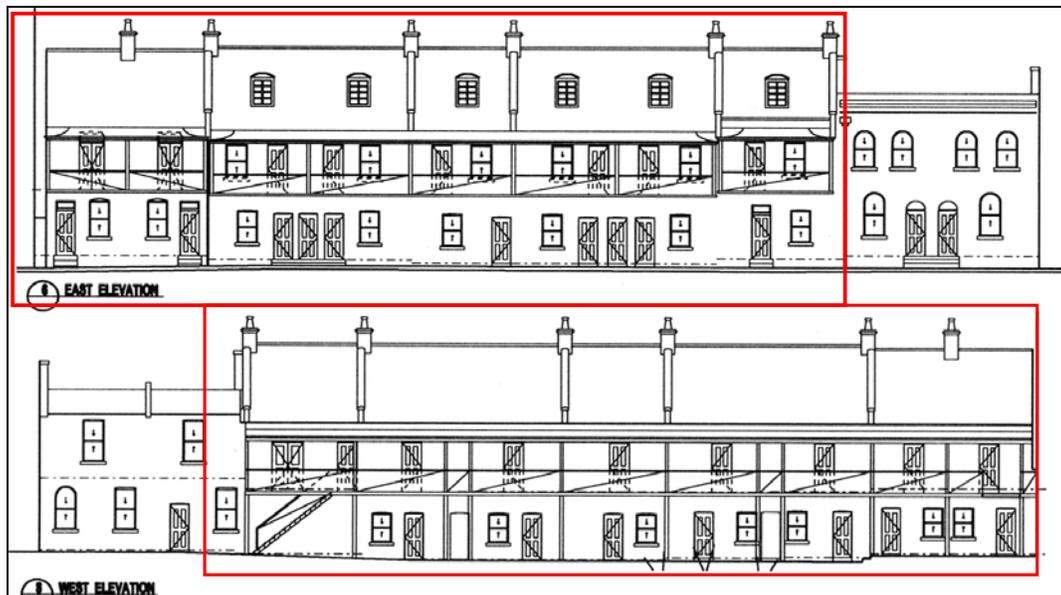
Building elevations (Source: Foreshore Authority July 2003).
